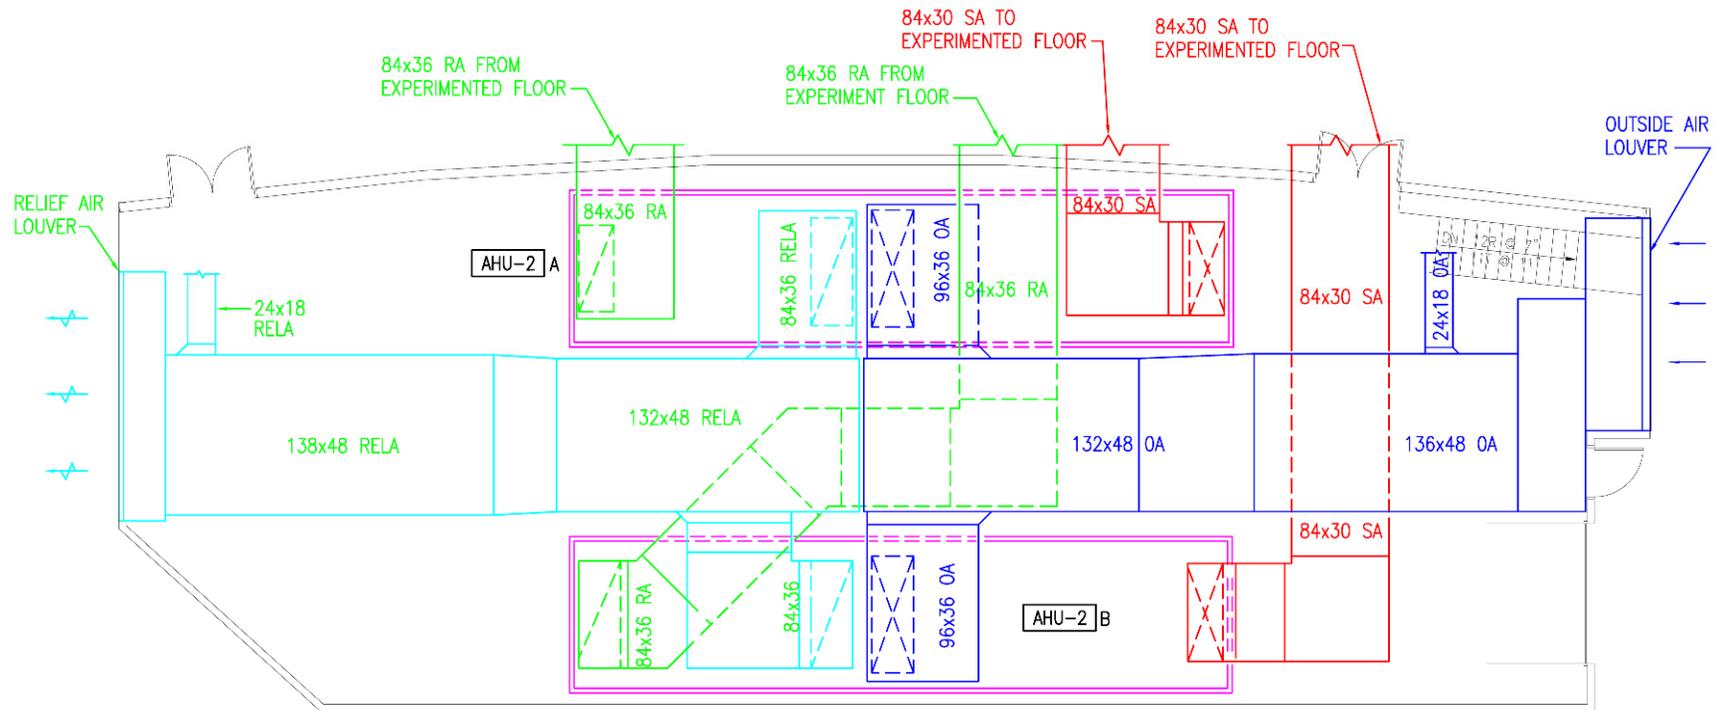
Floor plan layout of one half of HVAC supply and return ducts for Experimental Hall from AHU in one MER.
